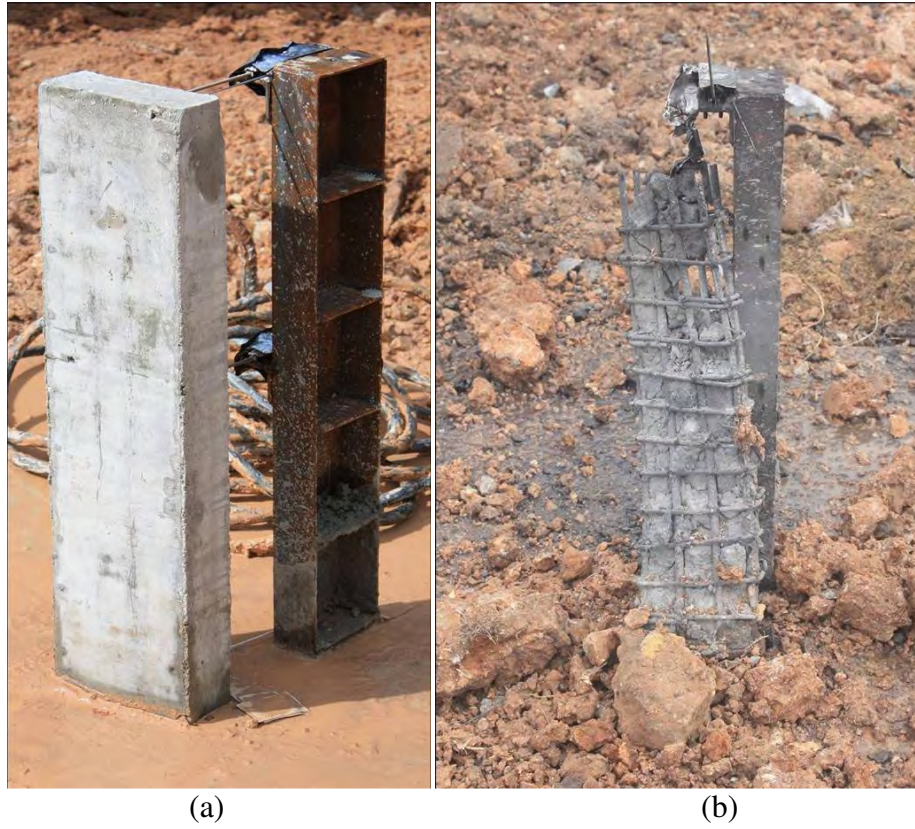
Q-UC-5-MI specimen (a) Before (b) After explosion
